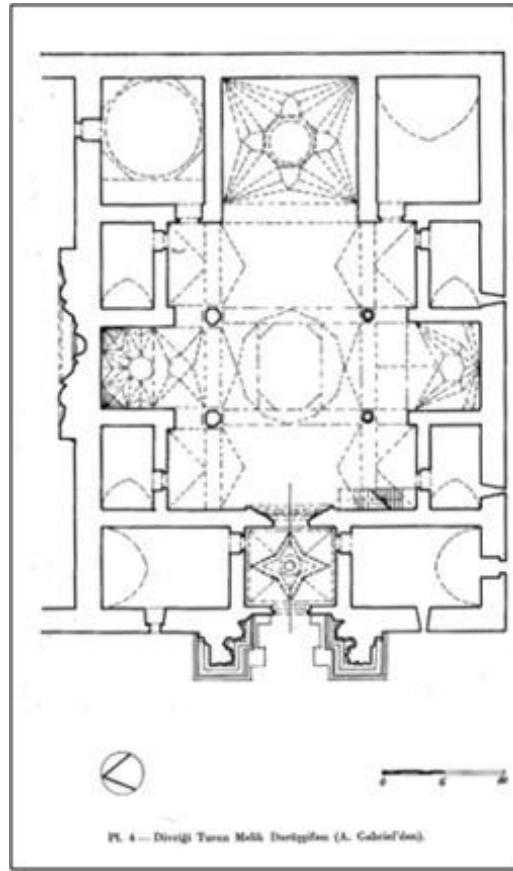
Turan Melike Hospital, Cantay 1992, plan 4.
